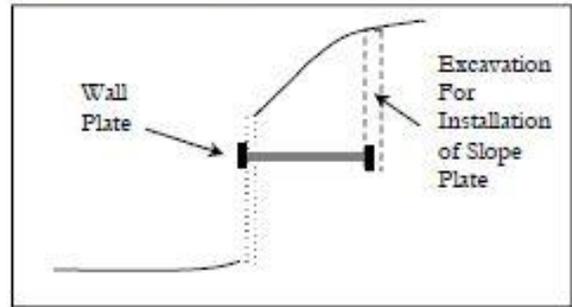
B. Plate anchors require excavation of a vertical hole to connect soil plate to metal rod. Plate surface area proportional to holding strength.
